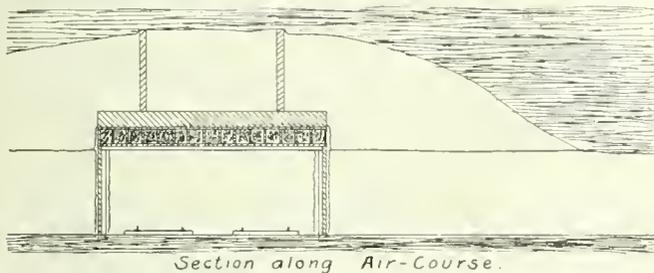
PROTECTED OVERCAST WITH LIGHT WALLS
